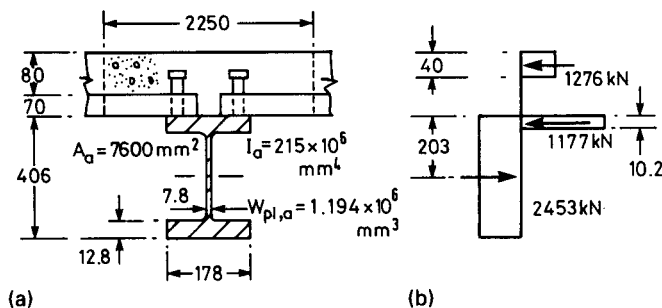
Cross-section and stress blocks for composite beam in sagging bending.
